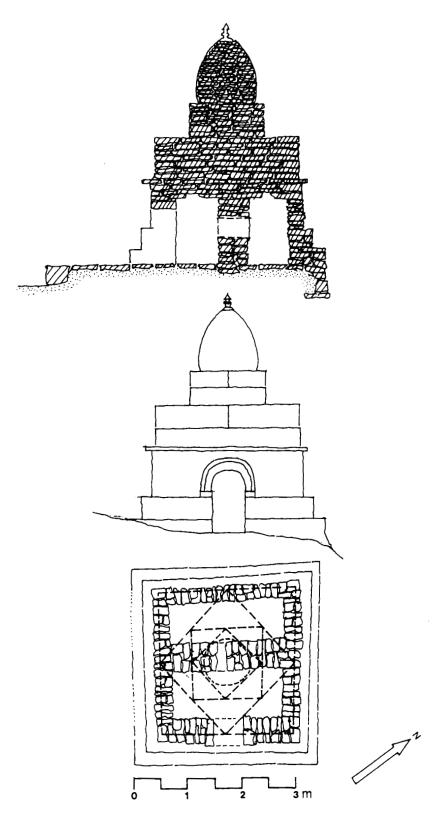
Siddhanāth Mandir near Kālkot, ground plan, elevation west and section.
